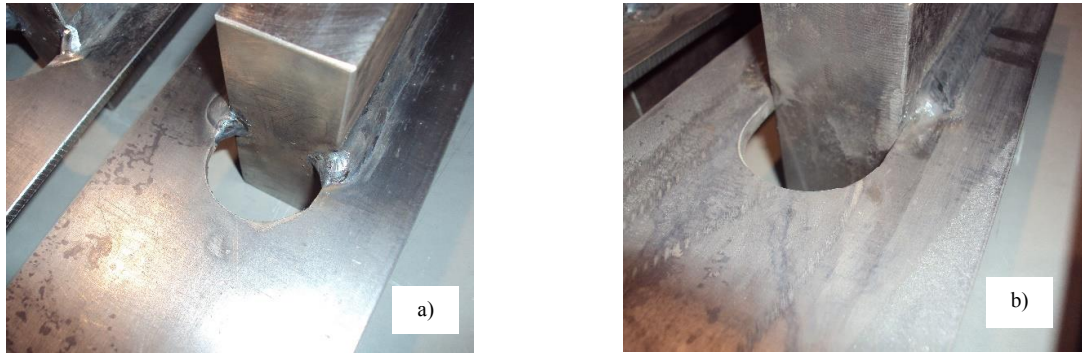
Welded joint details: a) fillet weld according bridge detail; b) fillet weld according EC3.
